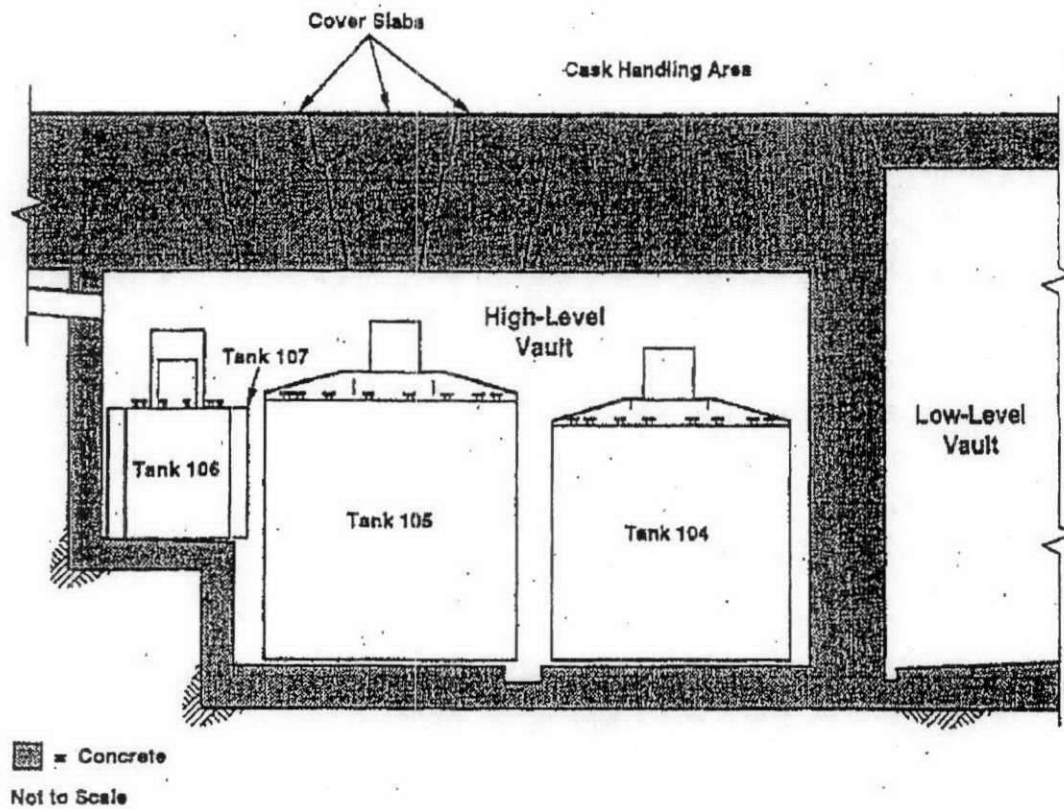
324 Building High-Level Vault Cross-Section.
